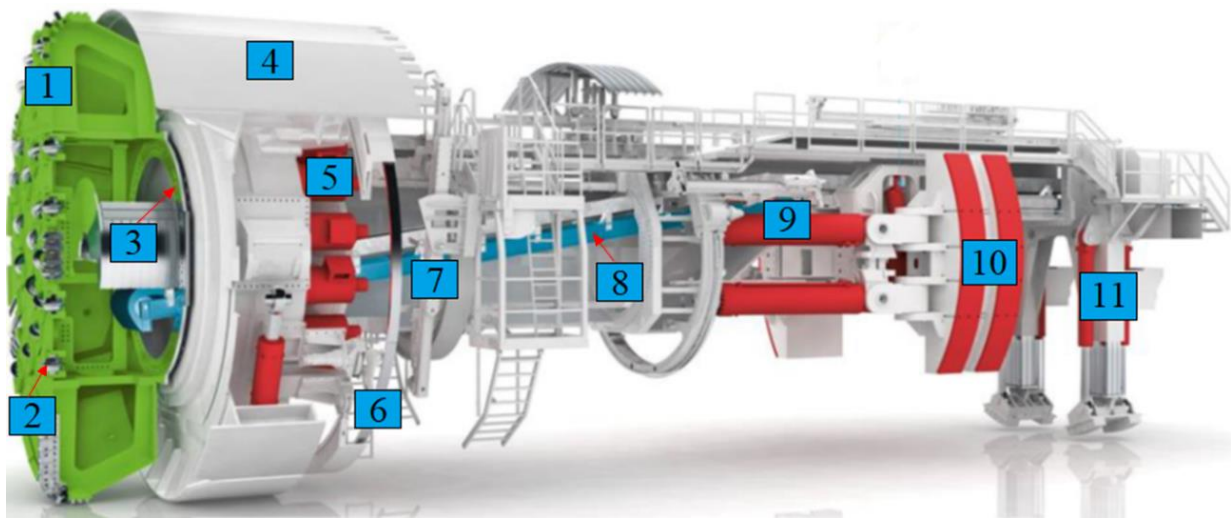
Diagram of main structure of an open-type girder TBM (1. Cutterhead; 2. Disc cutter; 3. Spindle; 4. Top shield; 5. Cutterhead drive motor; 6. Steel arch assembly machine; 7. Jumbolter; 8. Belt conveyor; 9. Thrust cylinder; 10. Gripper; 11. Back support).
